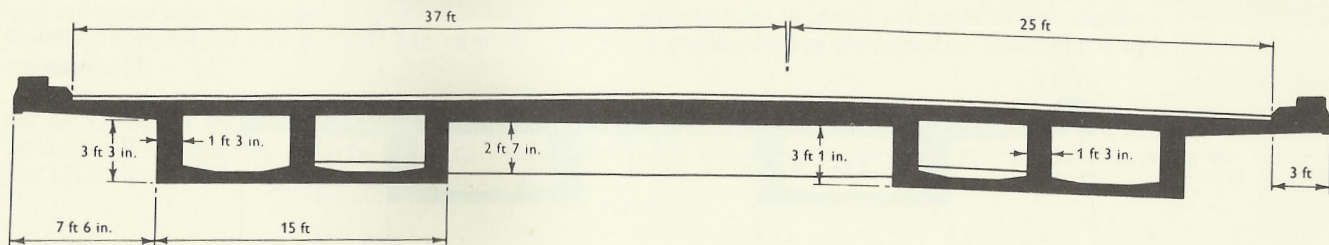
Typical cross-section, five-lane elevated road superstructure.
